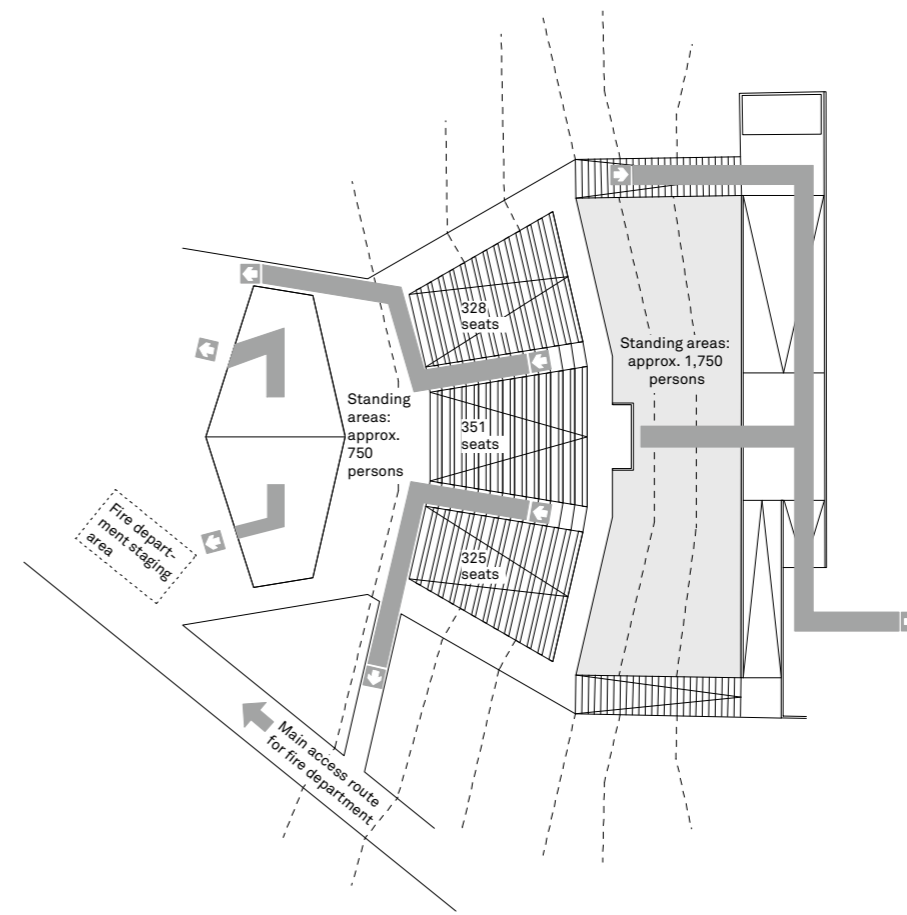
Example for an escape route plan, as exemplified by the outdoor theater in Spremberg
